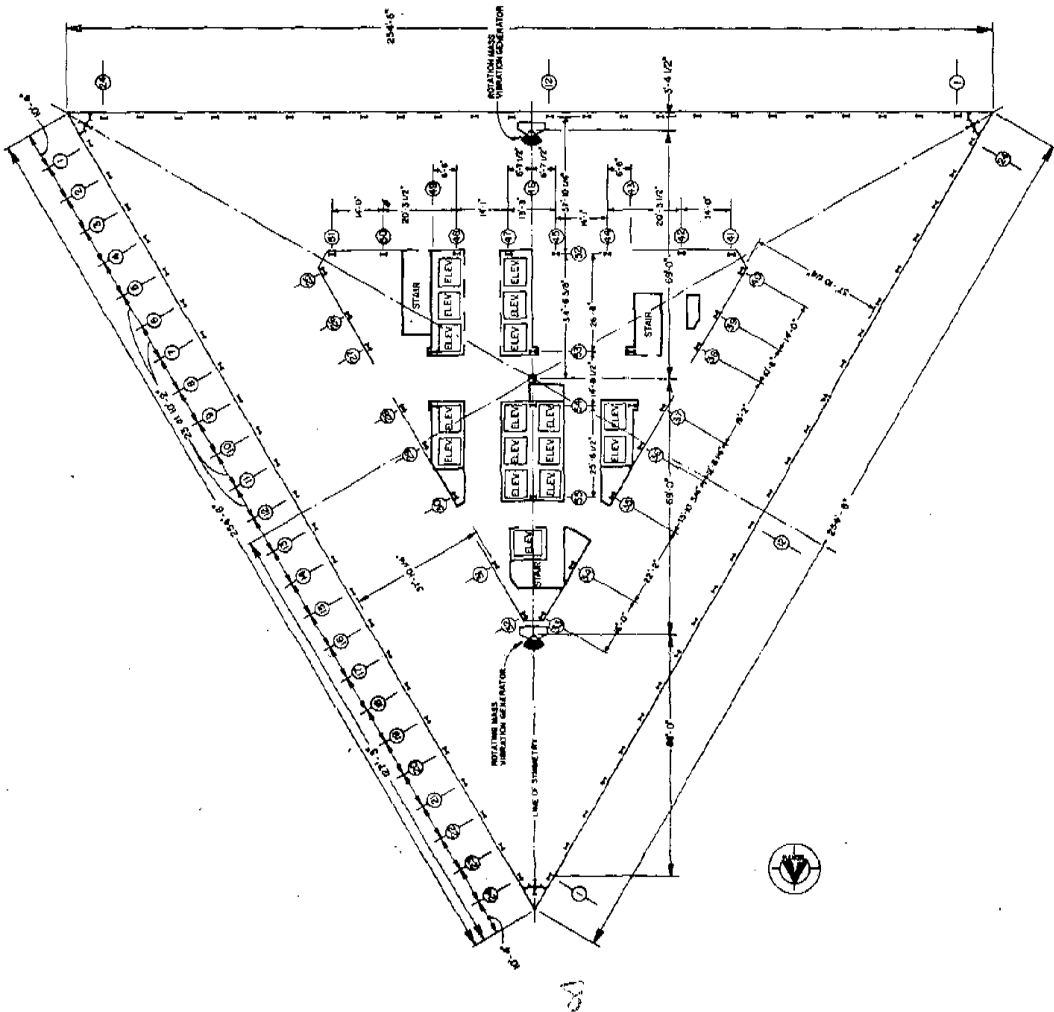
FLOOR PLAN AT 42ND FLOOR
